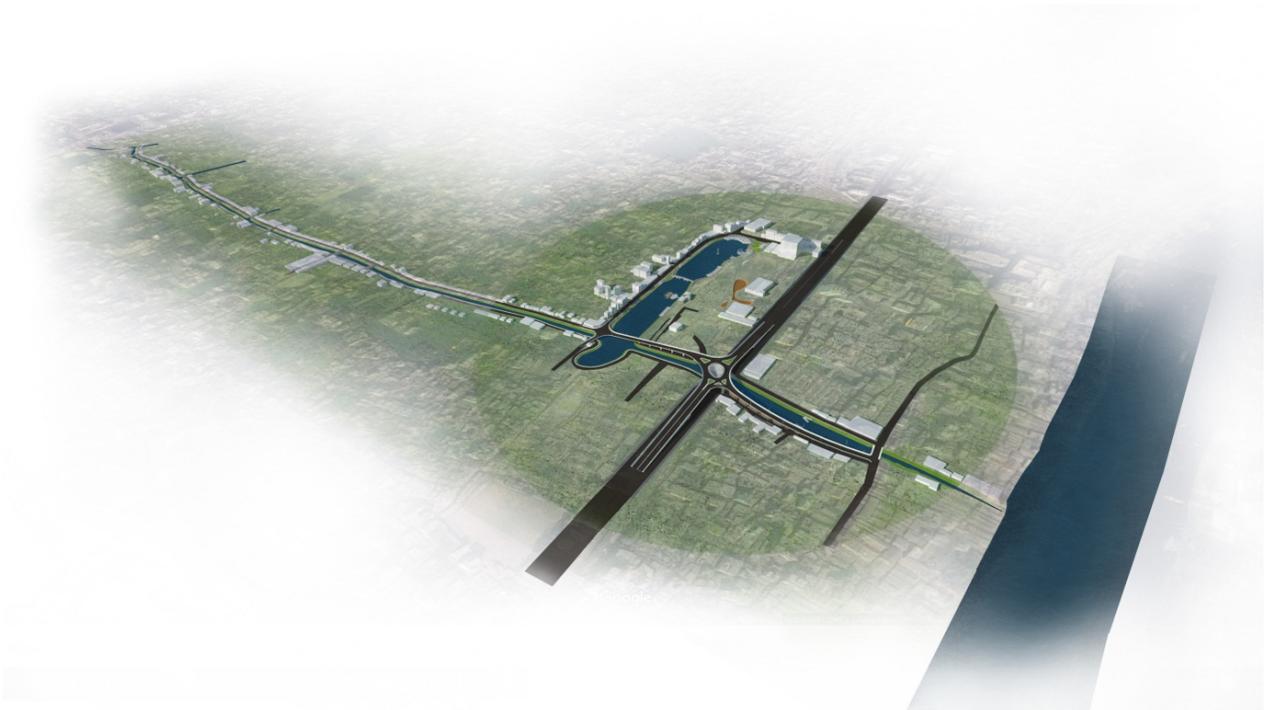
Proposal of Baburail Canal beside R. K. Mitra Road
